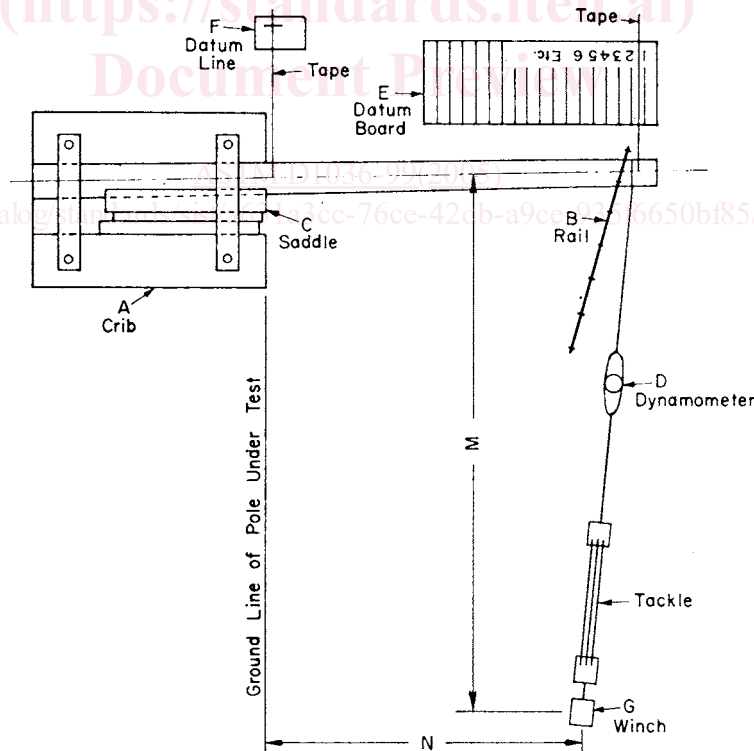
Schematic Layout of Field Mechanical Tests of Wooden Poles
